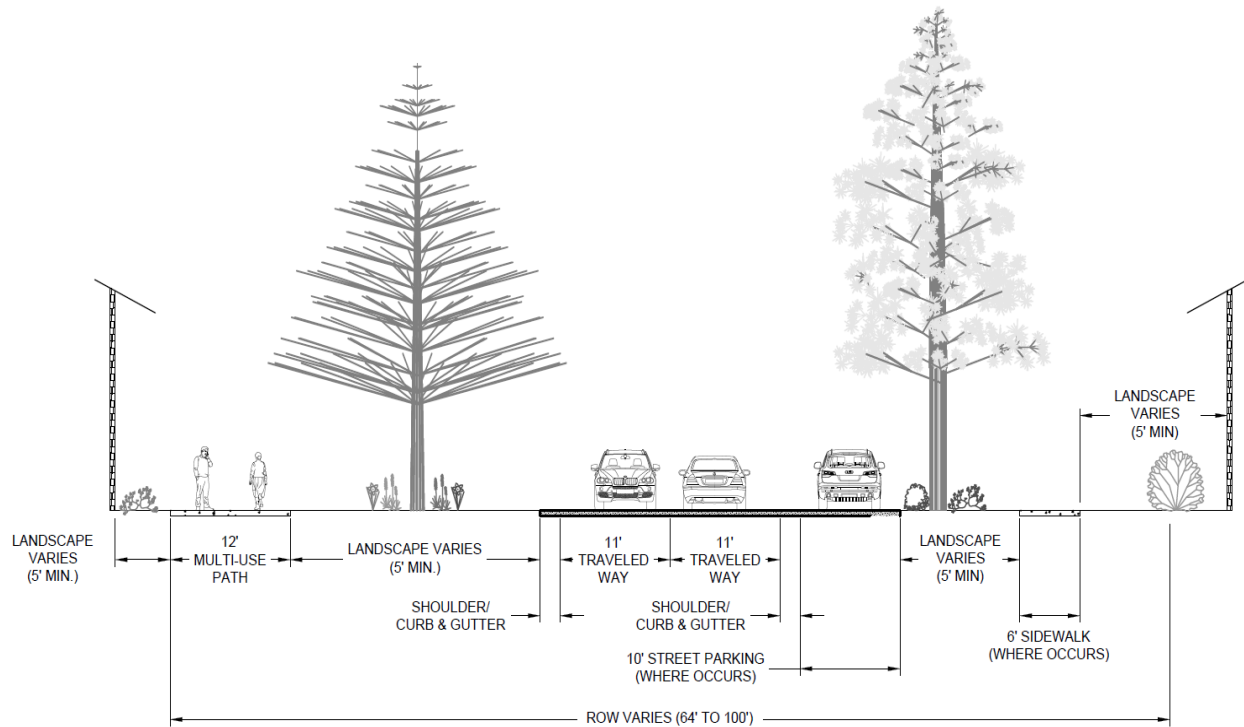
Typical Road Section (Chaparral Road, Tavern Road & Center Street)
